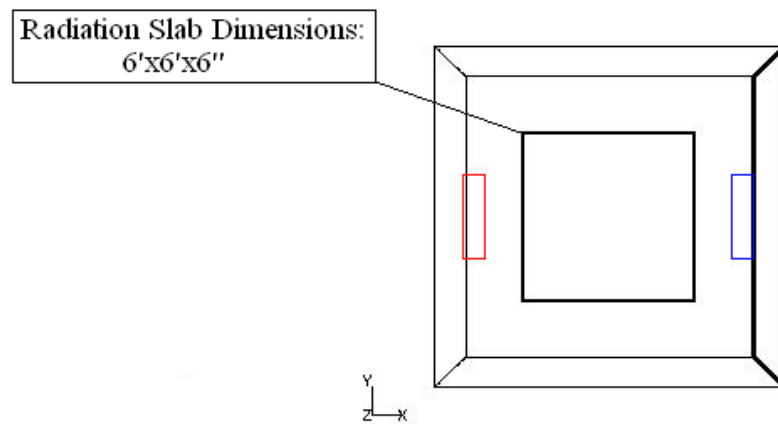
Case 2 - Plan View of the Ceiling with Radiation Slab and Vents
